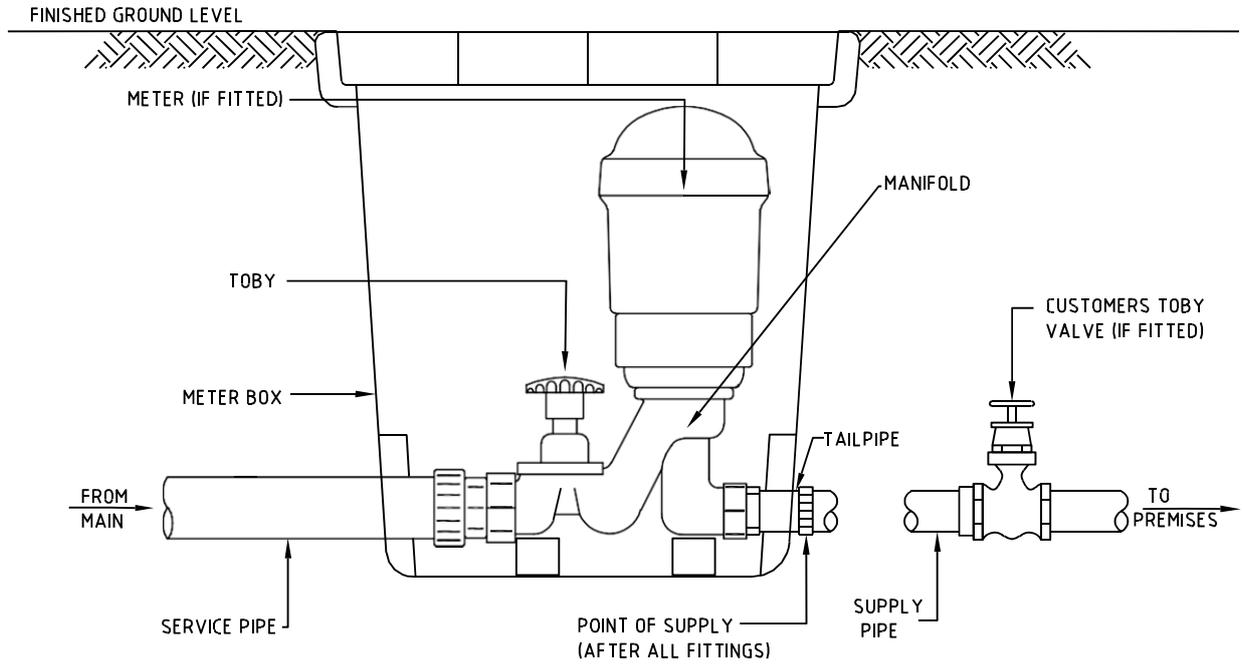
Typical Point of Supply - On Demand Supply - Multiple Premises (accessed by Right of Way, new connections)
